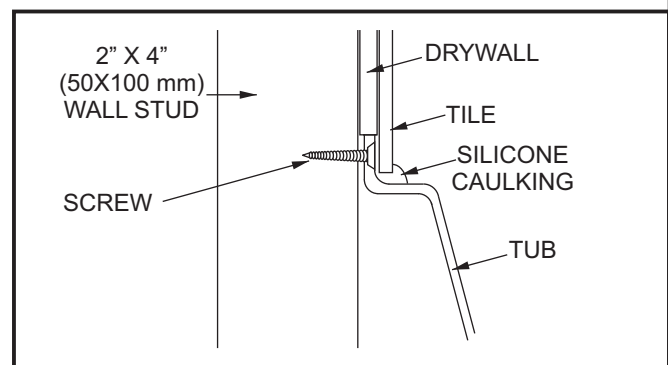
WALL INSTALLATION FOR TUBS WITH TILE FLANGE
